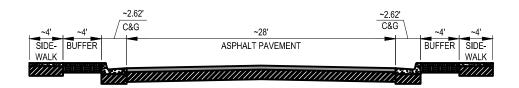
EXISTING JANE STREET TYPICAL SECTION
